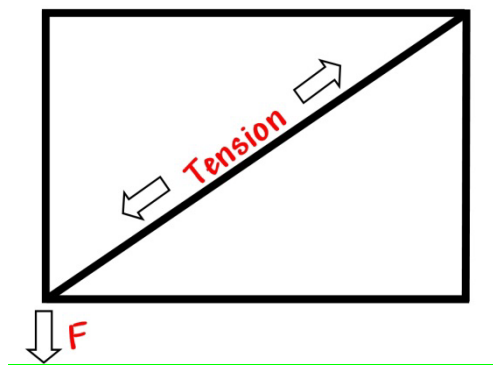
Arrangement of elements of a truss in a triangular configuration.
